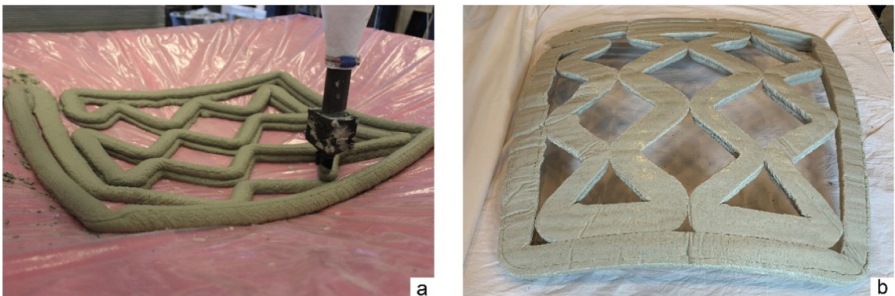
(a) Printing inner geometry for the panel. (b) The final result of the double-curved panel.
